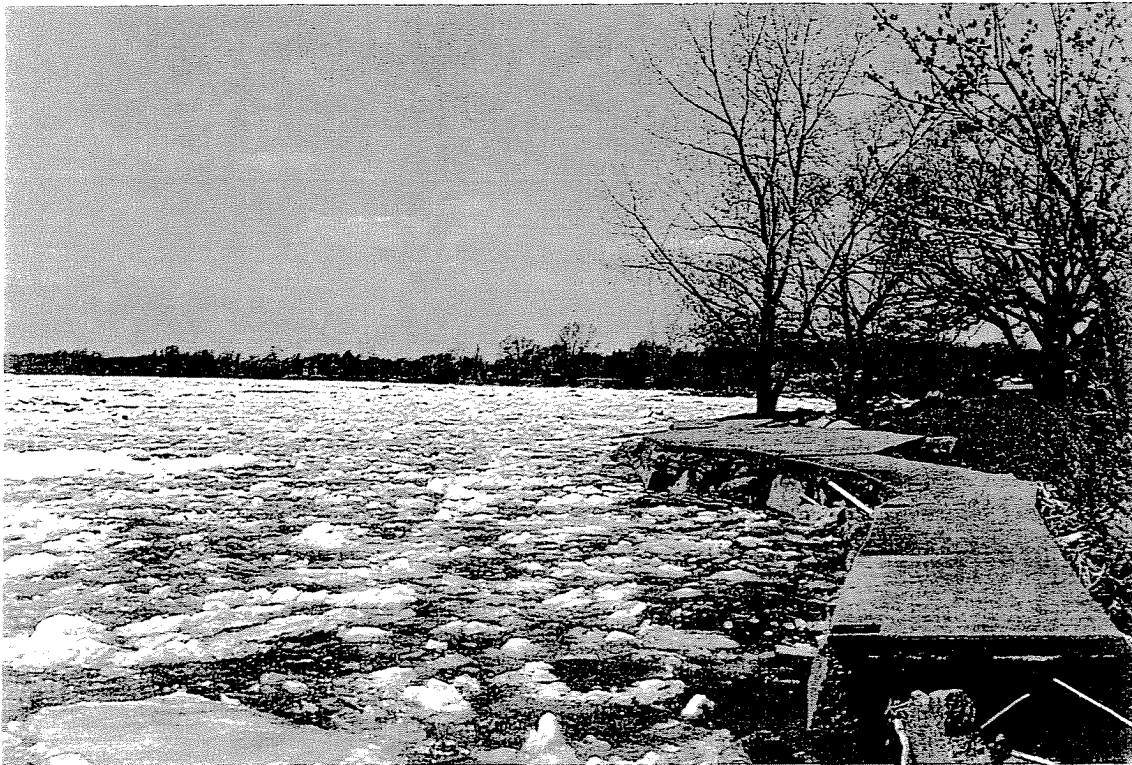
River and bank in the easternmost section of the park showing old sidewalk remnants used as rip-rap facing northwest from the shore near the eastern park access road and groundwater well 5.
